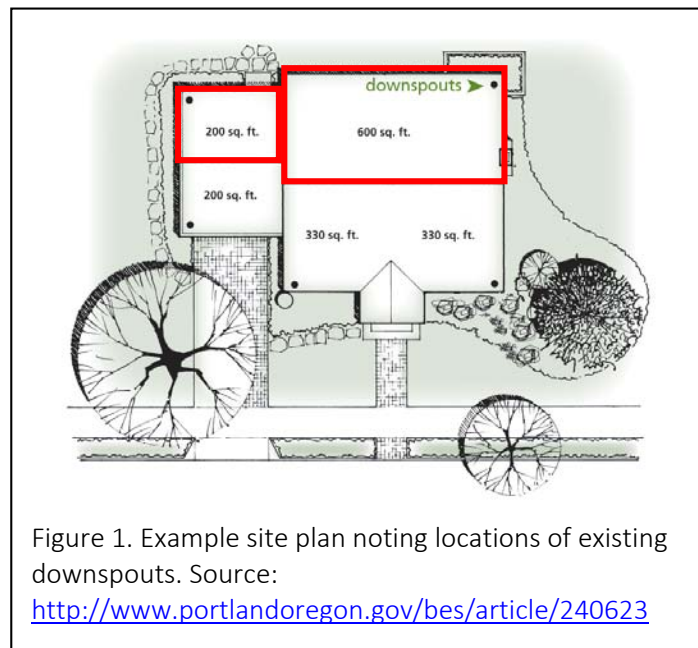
Example site plan noting locations of existing downspouts. Source: <http://www.portlandoregon.gov/bes/article/240623>
